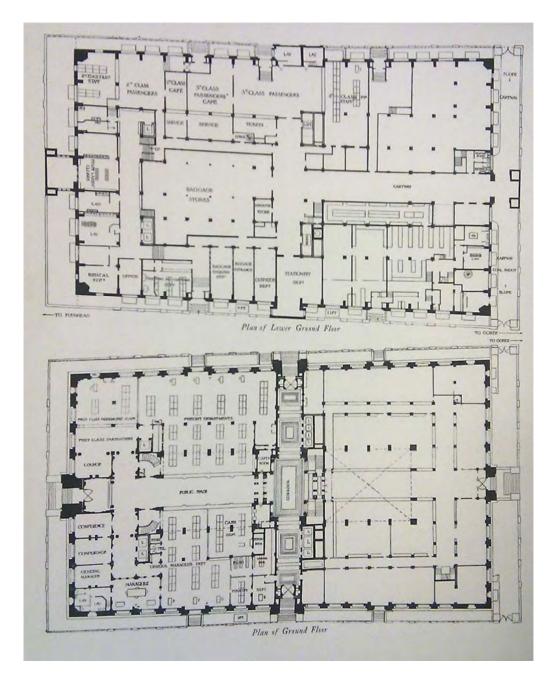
Liverpool University Archive: Plans of Lower Ground Floor and Ground Floor at Opening of Building - Commemorative Brochure 1917
